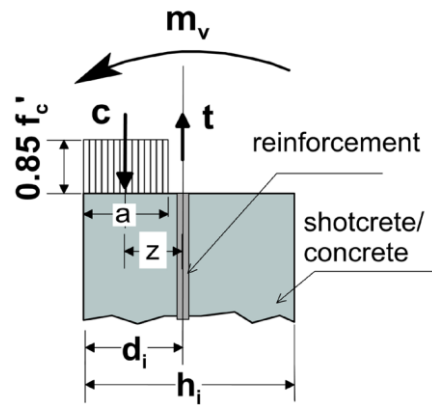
Bending mechanism of shotcrete facing (FHWA 1998)
